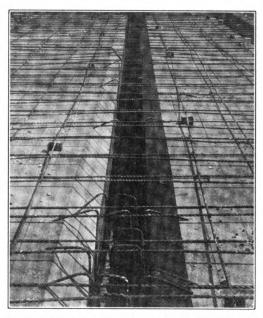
Detail of Floor Construction, with Wooden Forms and Reinforcing in Place.
